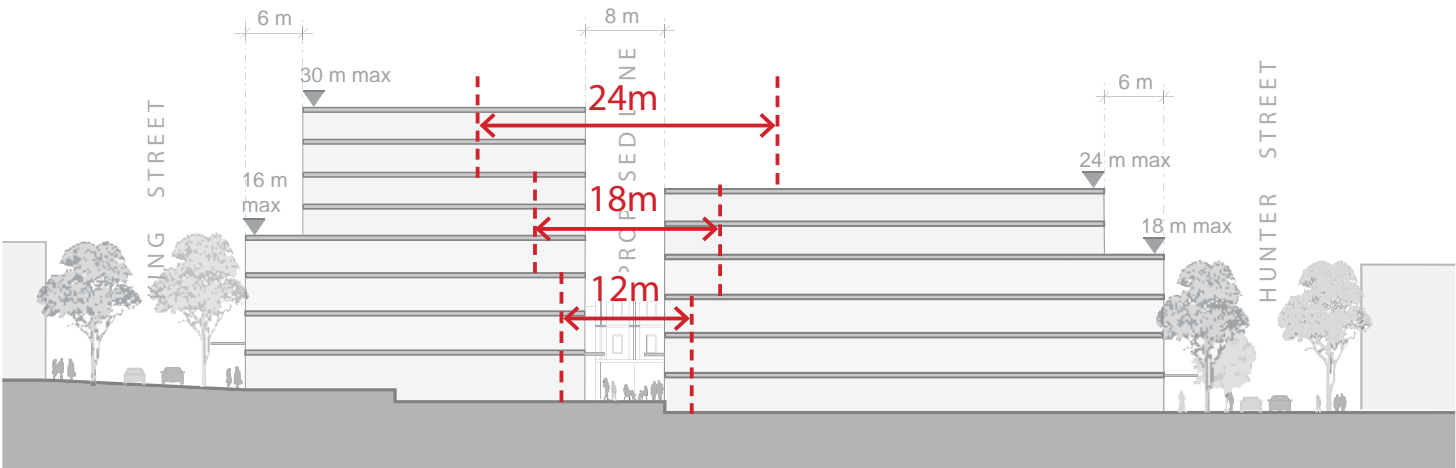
and 5.15 of the NURS illustrate the proposed laneways, building footprints, street frontage heights, setbacks above podium, building separation, based on the indicative plan at Figure 5.12.
